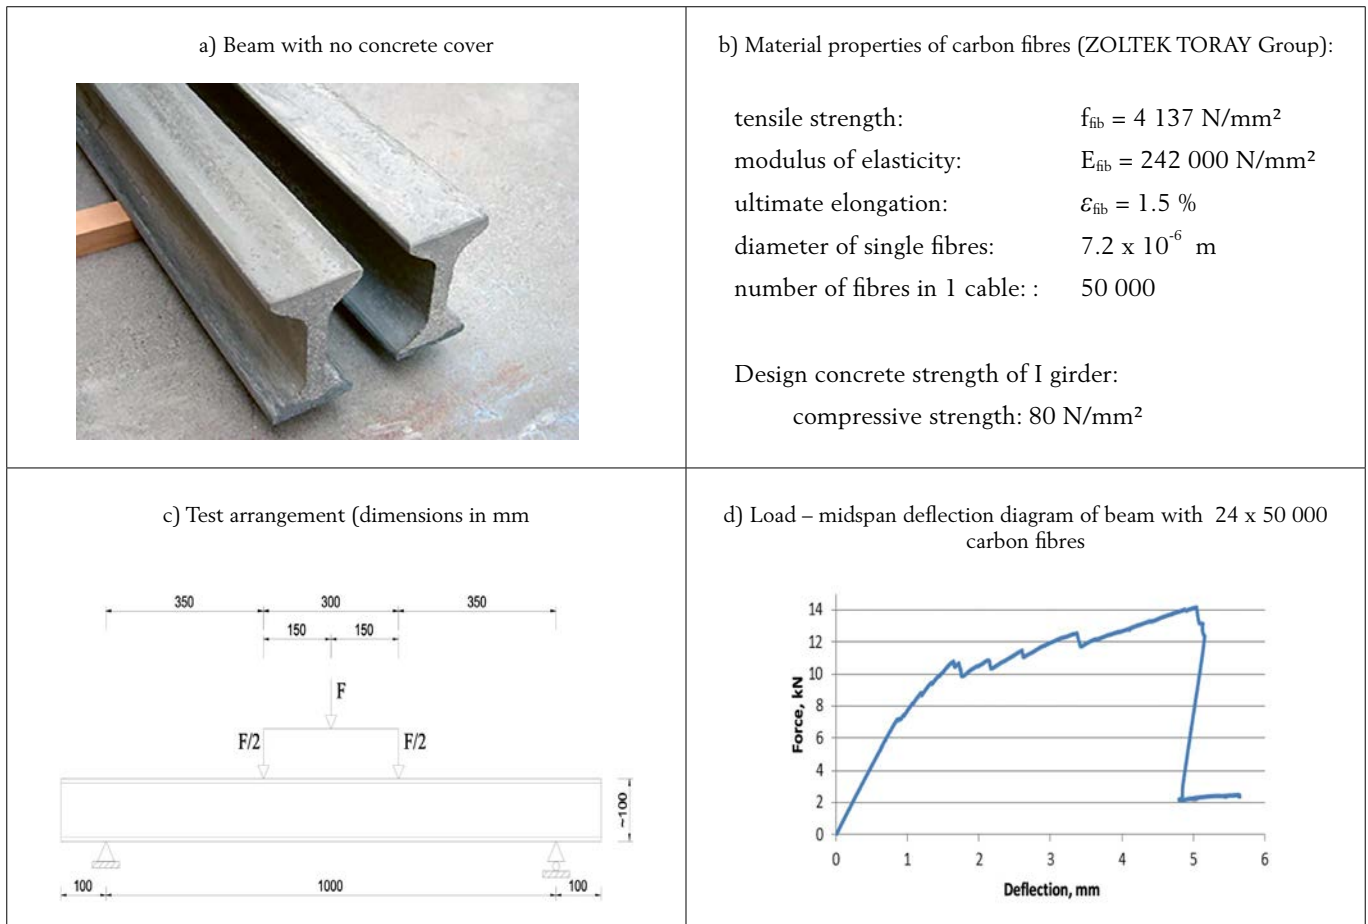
A concept with no cover of CFCM reinforcement in beam test, (Lab. of Construction Materials and Technologies, BME, Budapest) [14].
